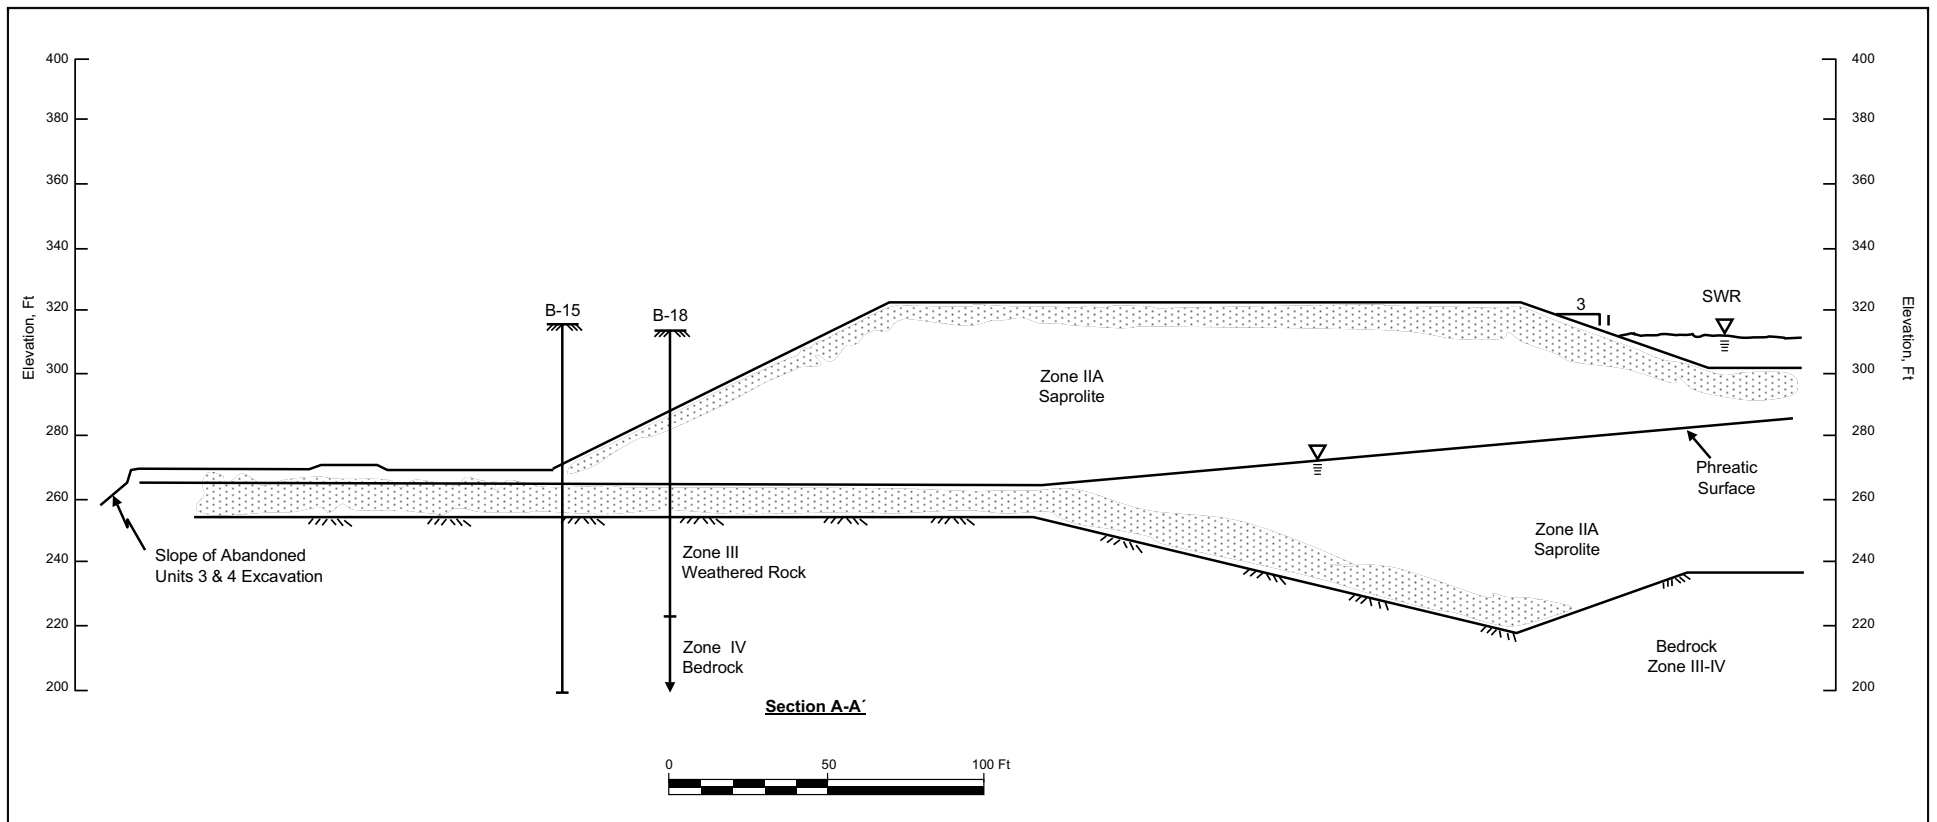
Cross-Section of Existing Slope North of the SWR
